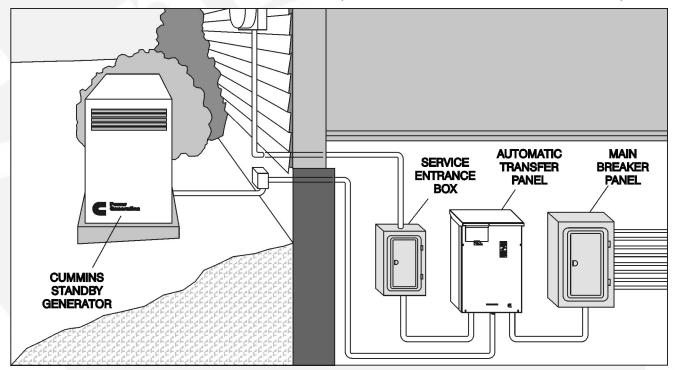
TYPICAL WALL-MOUNT INSTALLATION (SHOWN SCHEMATICALLY IN FIGURE 18)
